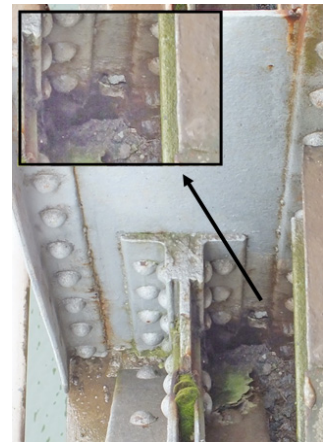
Corrosion in the lower parts of the elements due to water retention and a layer of moss between the steel sheets, hole on the steel sheet
